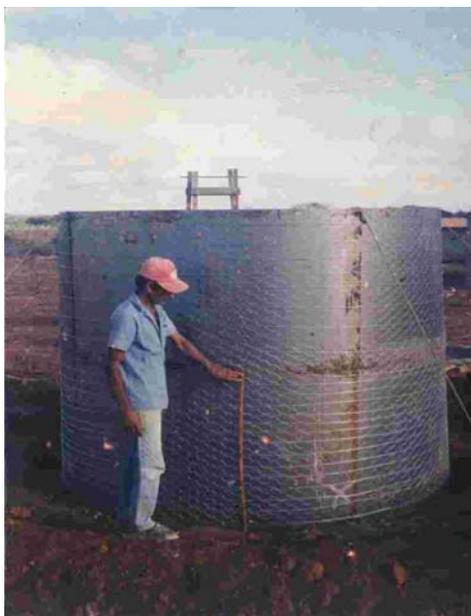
Steel sheet form, wrapped by wire mesh and galvanized wire
